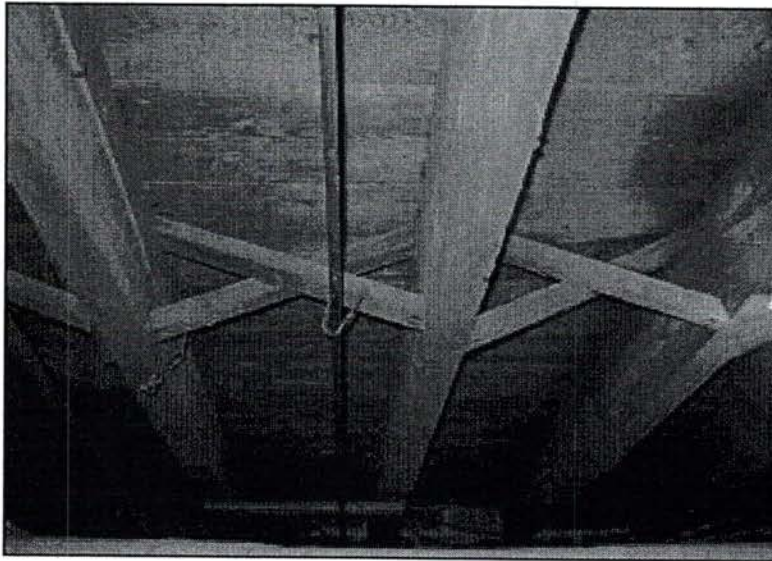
View looking west in Room 002 showing the bracing between the first floor joists.
